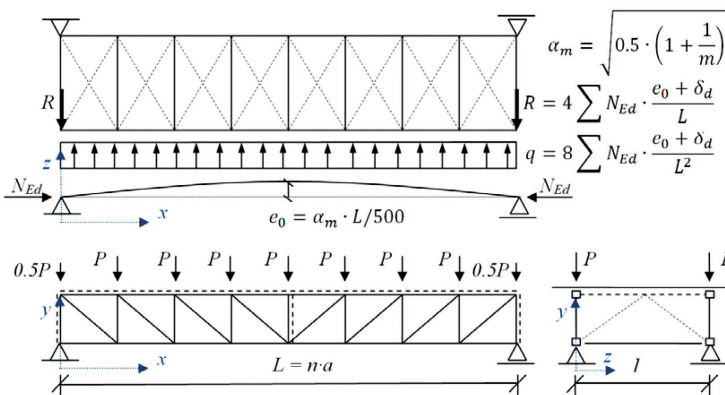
Standard-indicated notional load of transverse roof bracing originating from a girder with imperfections
